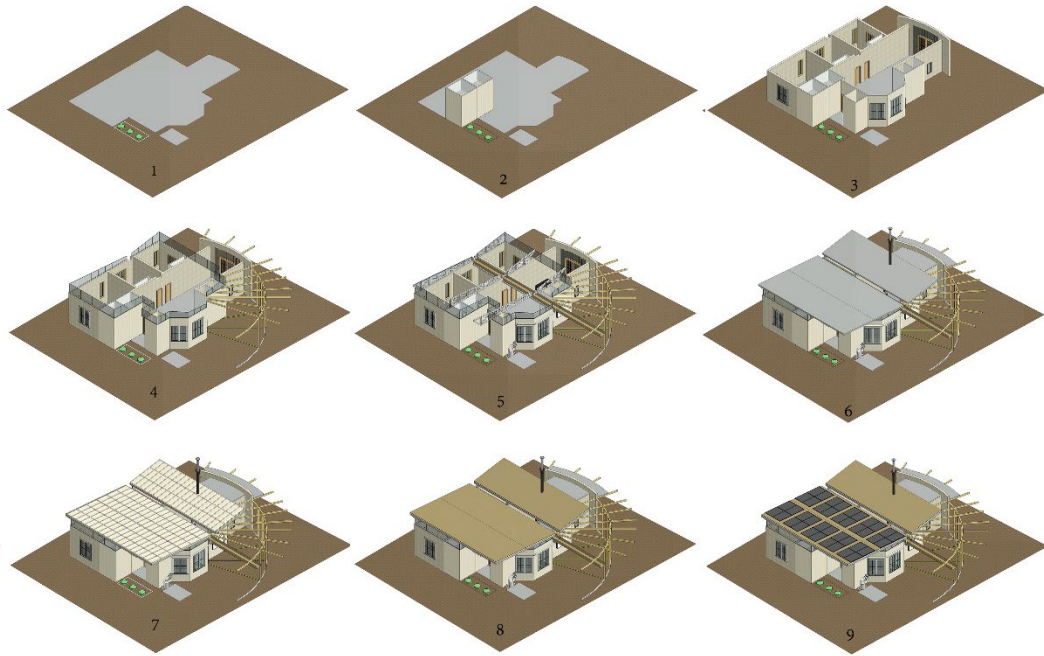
Construction Steps of the Proposed 3-Bedroom House Design
